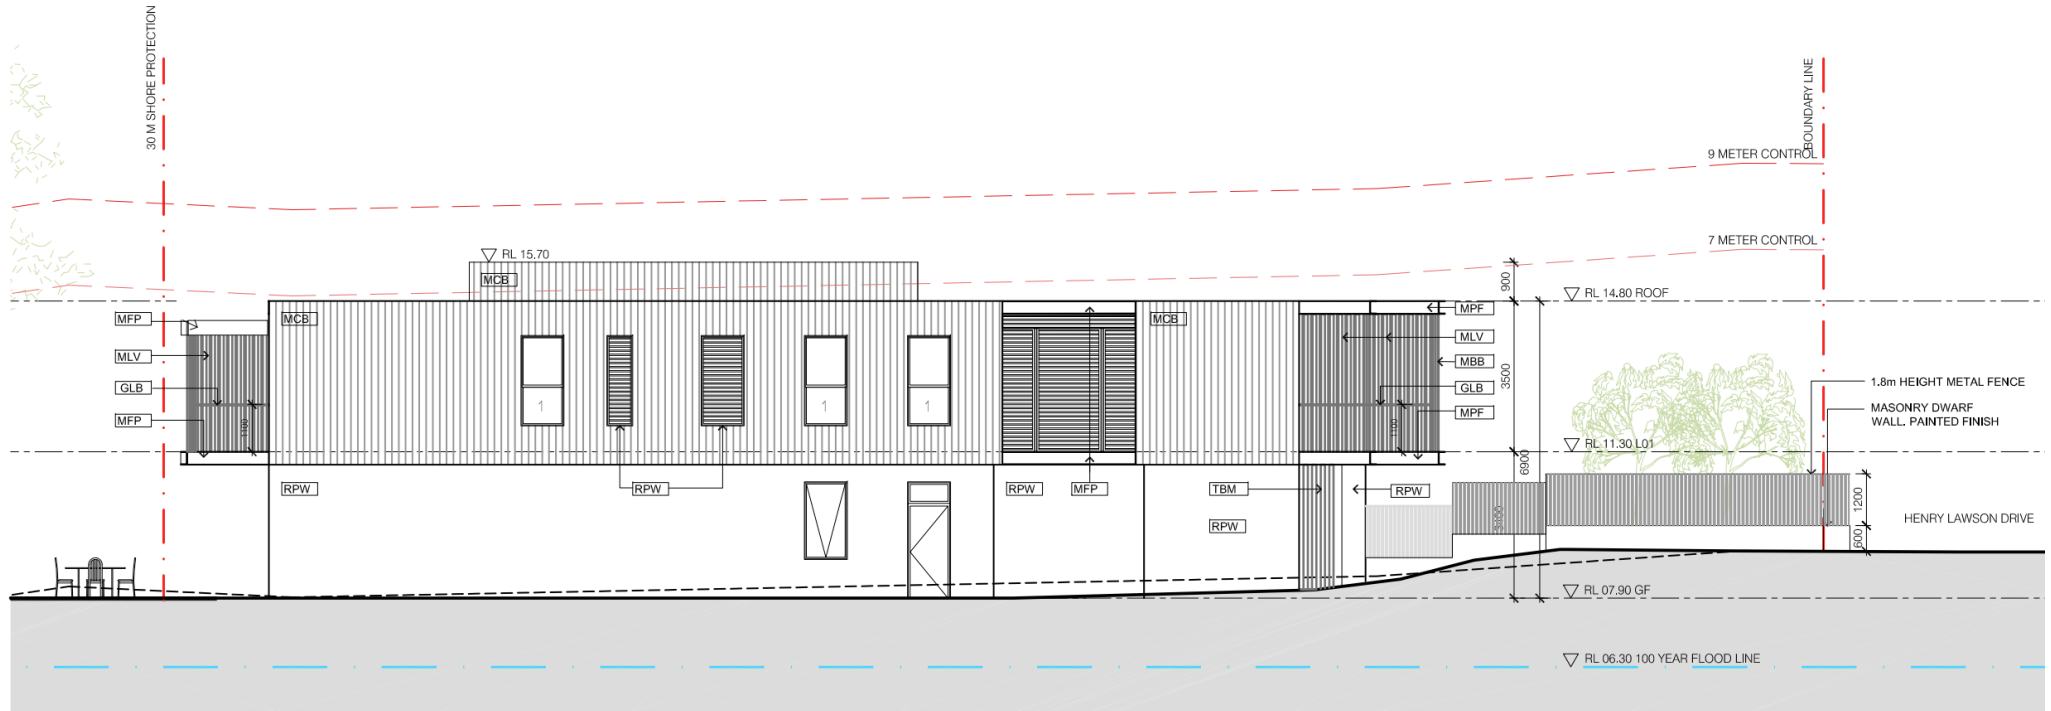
South East Elevation for S4.55(2) submission prepared by Alvaro Architects.
